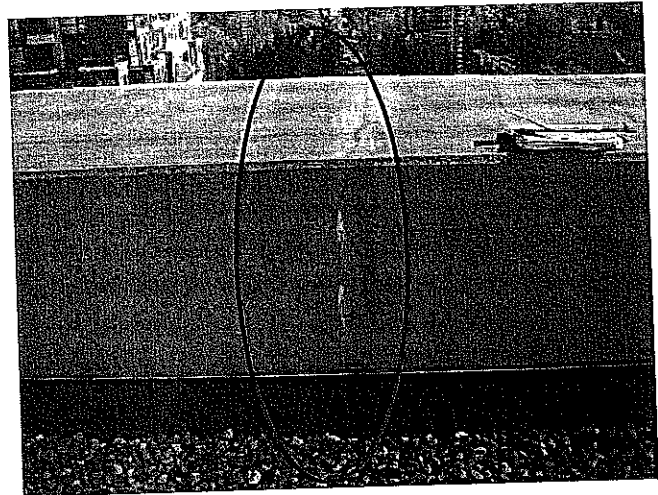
Typical crack in main roof concrete parapet.
